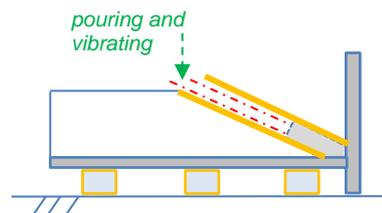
Closed form; concrete pouring and compaction only possible from top
